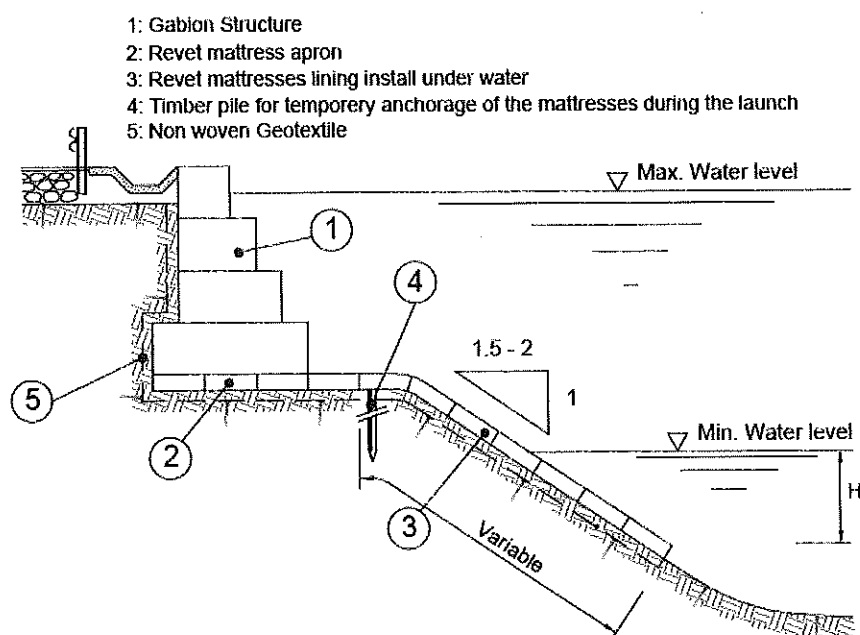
Revet Mattress Foundation of a Retention and Protection Structure of a Road Embankment. The revet mattress were installed partially under water.
